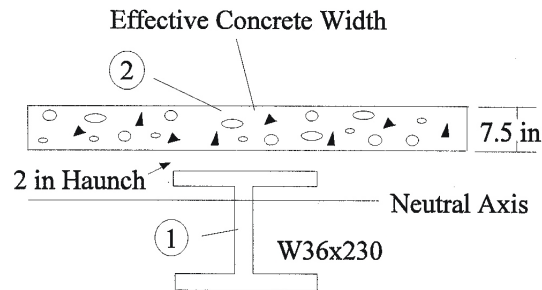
Composite Concrete Bridge Deck, Detail No. 3
